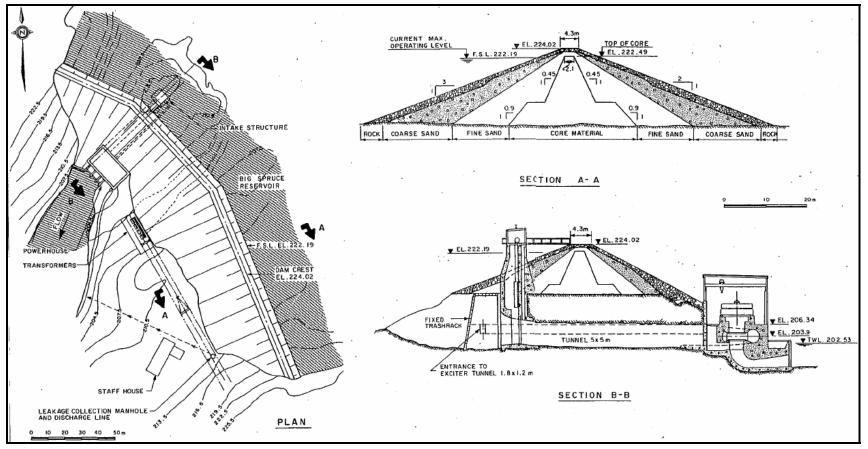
Snare Rapids G.S. – Layout and Typical Sections
